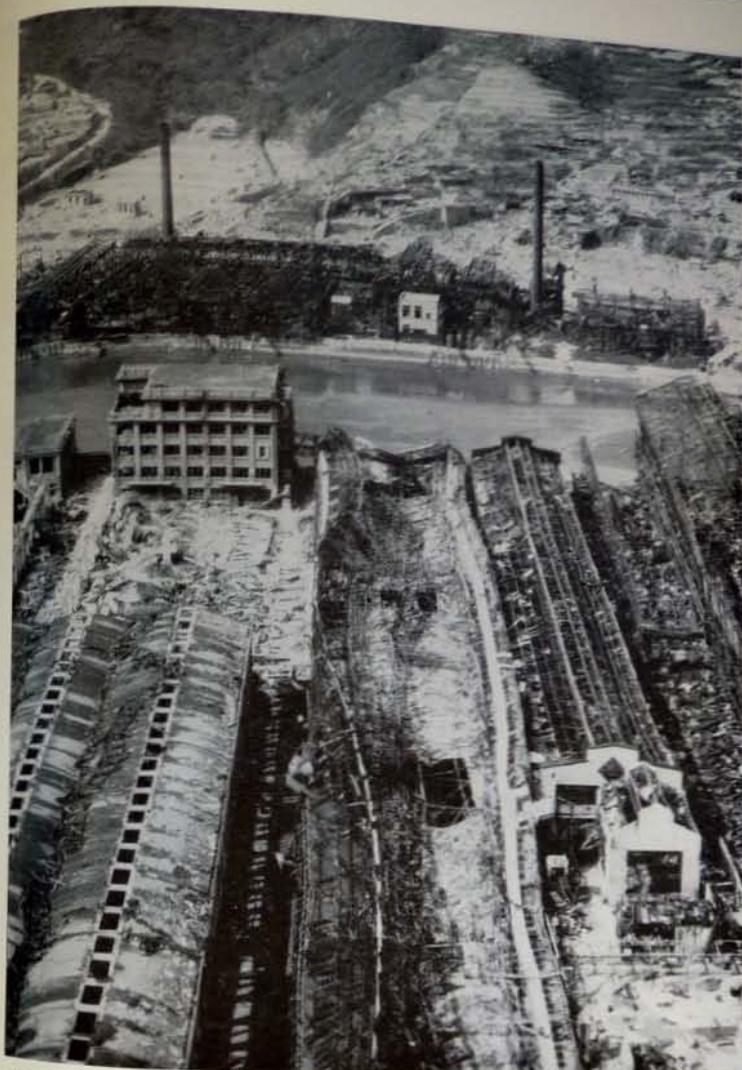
4,200 feet from GZ. Group 31. Casting Plant on west side of Urakami River. Mitsubishi Steel and Arms Works (Group 26) in the foreground.
